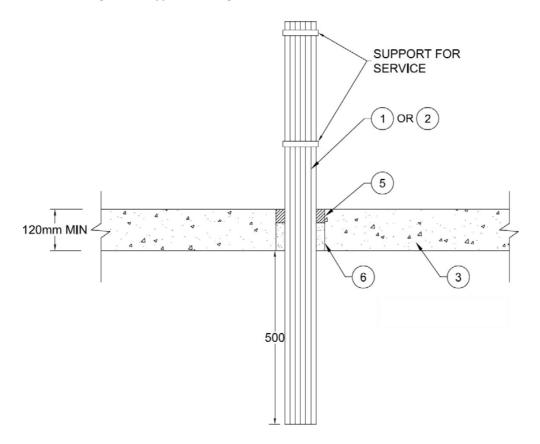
Typical details for cables penetrating floors with 3M IC 15WB+ sealant
